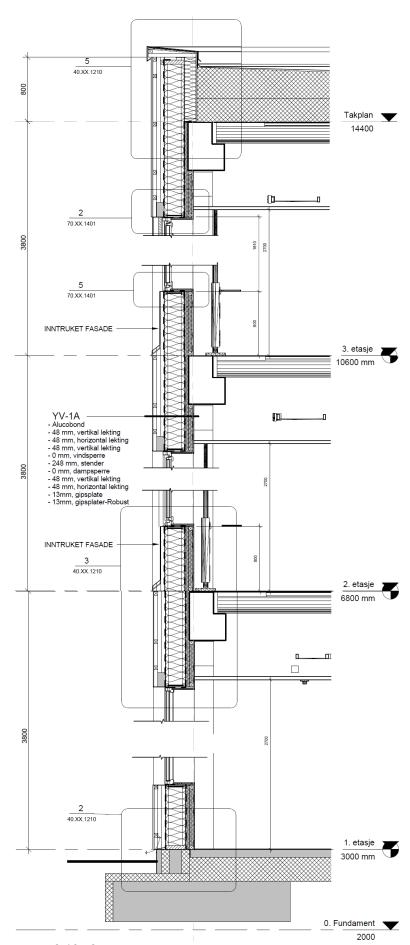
Cross section showing the exterior walls. Illustration: ABO Plan og Arkitektur.
